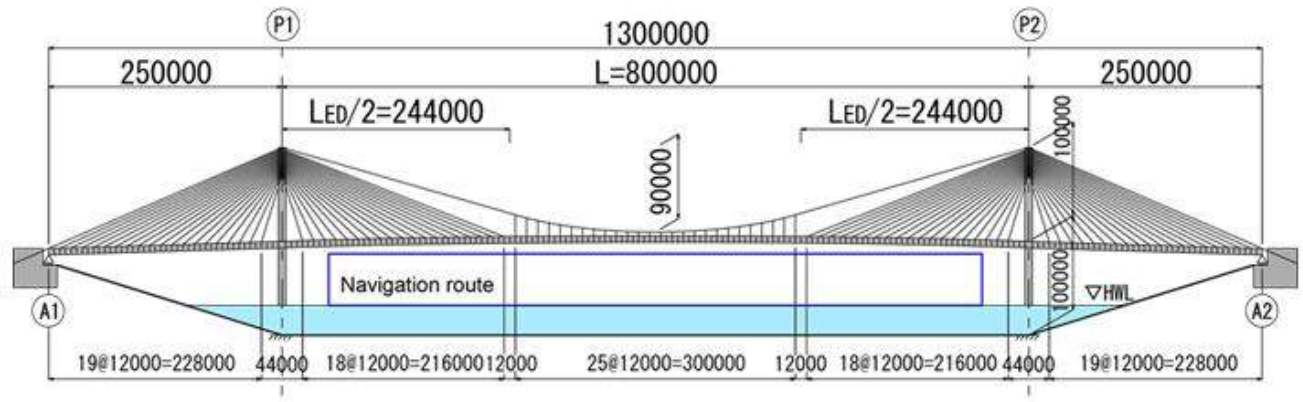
Hybrid of extradosed and suspension bridge with 800m span
